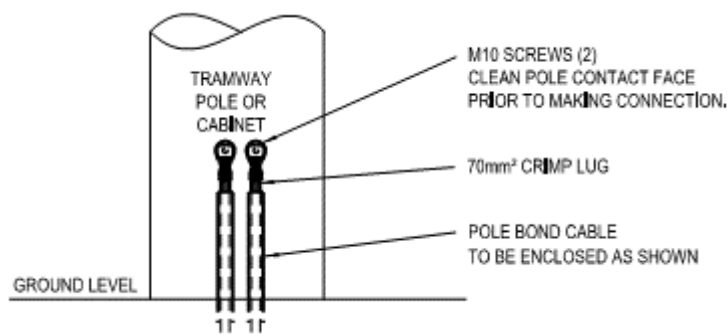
Typical Paved Track Pole Bond Installation
